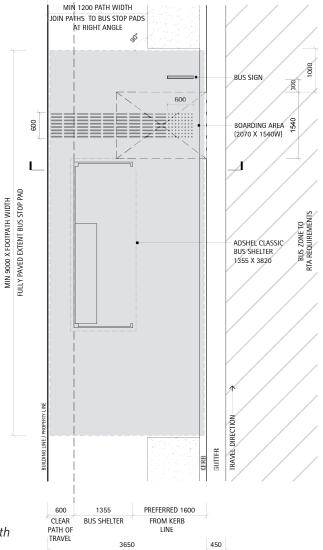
Bus Shelter on One Sided Streets with Standard Width Footpath: Adshel Classic
